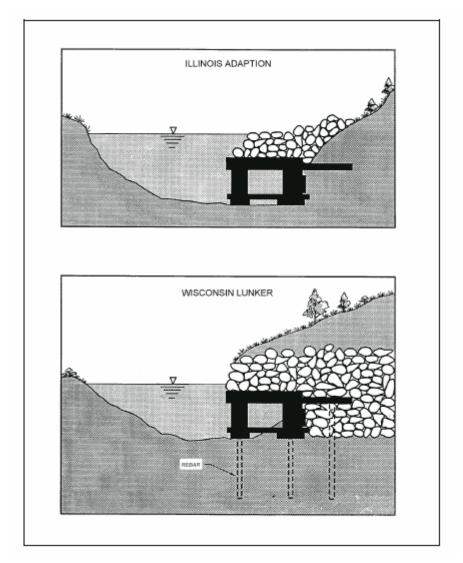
Schematics of LUNKER structures designed to provide overhanging shade and protection for fish while serving to stabilize the toe of a streambank. (Both versions use rebar although rebar is not shown on the upper schematic). After Allen and Leech (1997).
